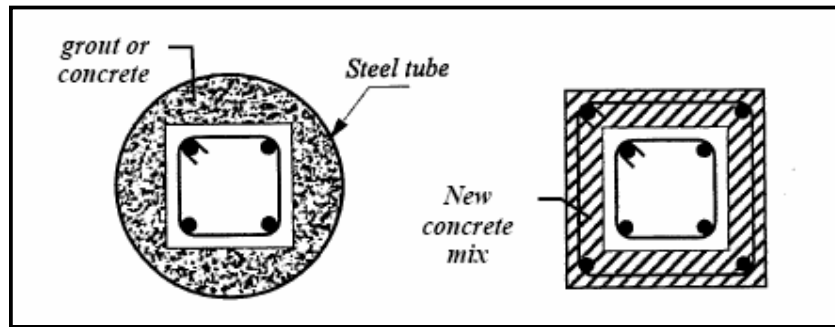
Increasing cross-sections of columns (Al-Salloum, 2002)
